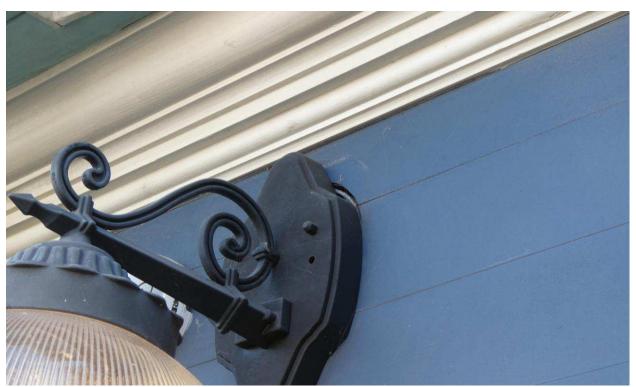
Detail showing gap between garage sconce escutcheon and wood siding.
